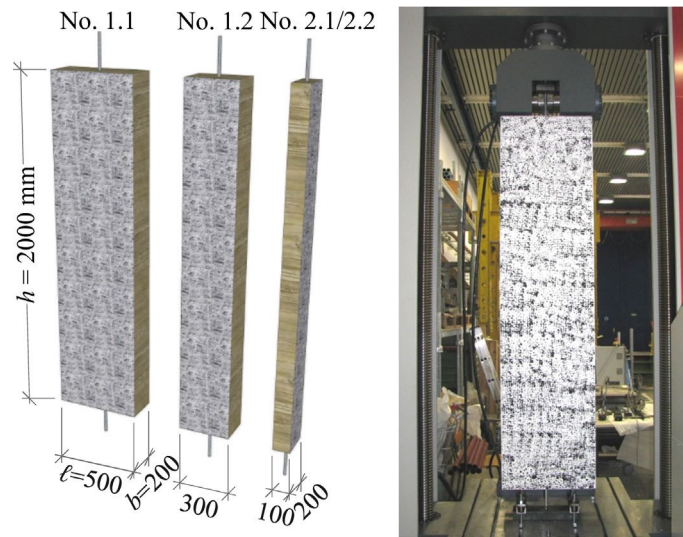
Geometry of test specimens (left) and specimen with black-and-white pattern in testing machine (right).
